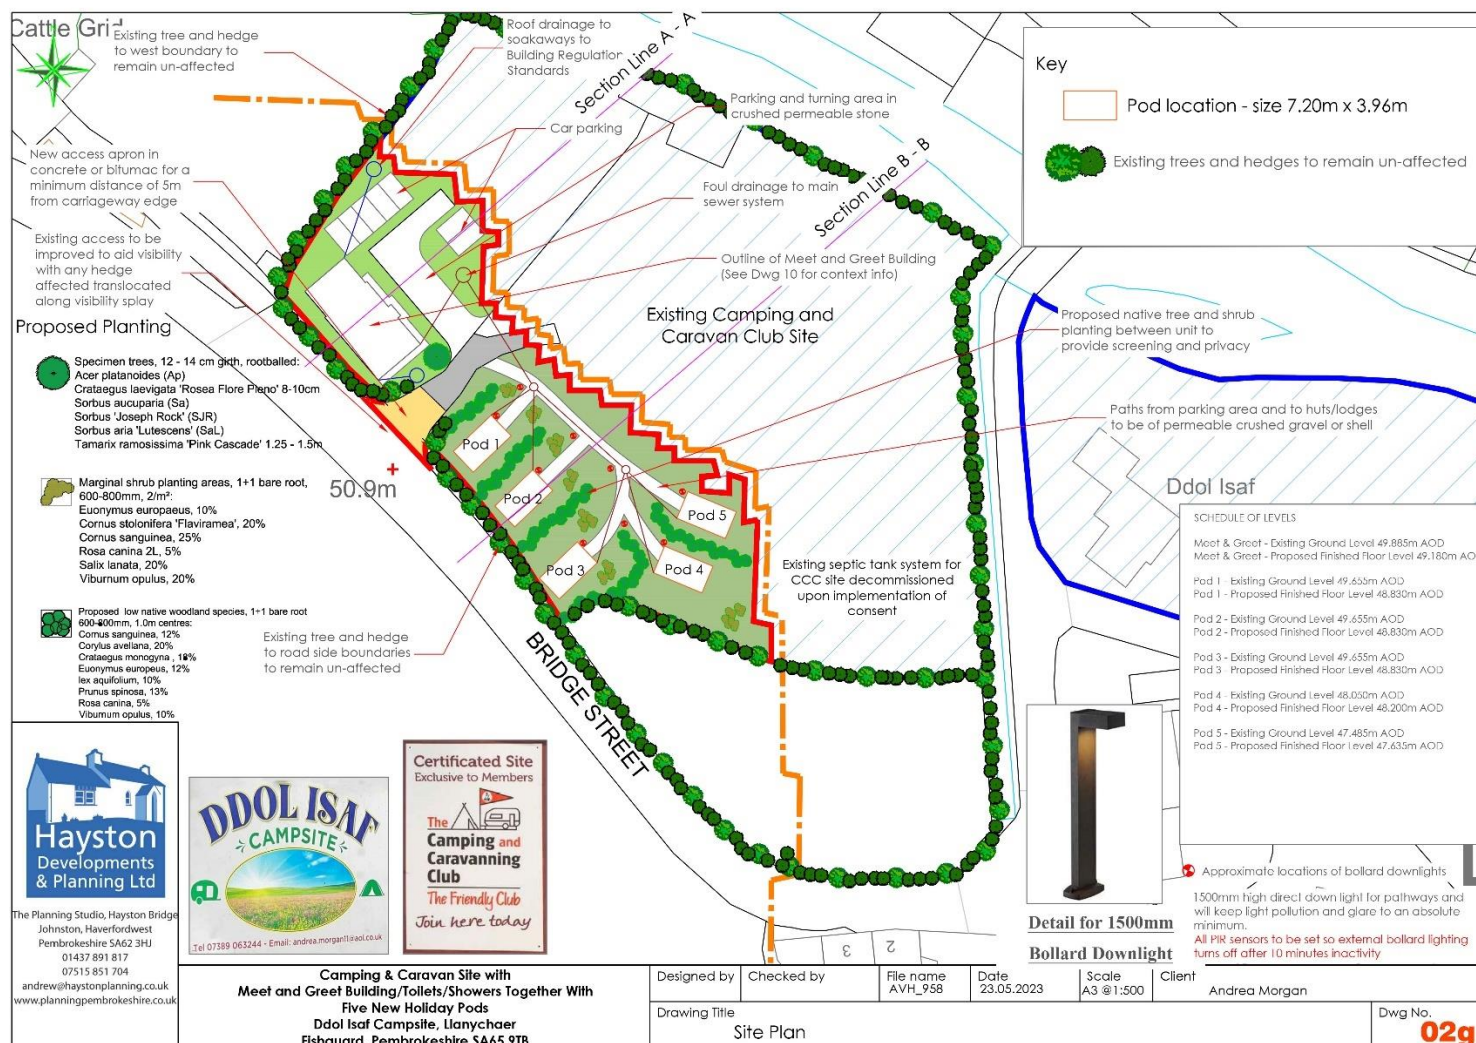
Proposed development plan. Plan provided by the client, not reproduced to scale.
